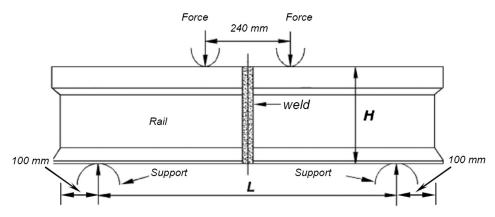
Fatigue test scheme for the flash butt welded rails.
